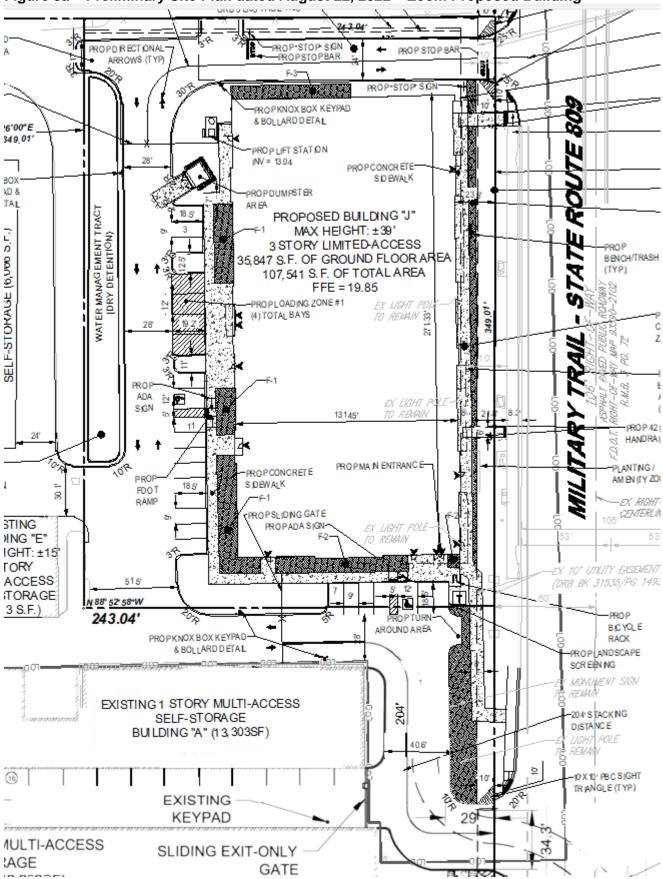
Preliminary Site Plan dated August 22, 2022 – Zoom Proposed Building
